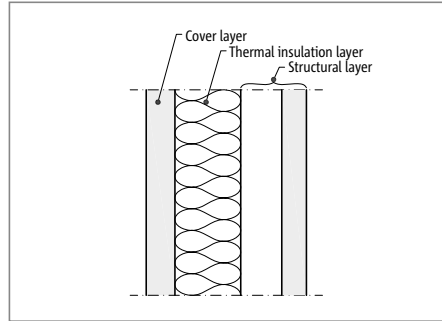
Section through an element wall; structural layer with in-situ concrete infill
